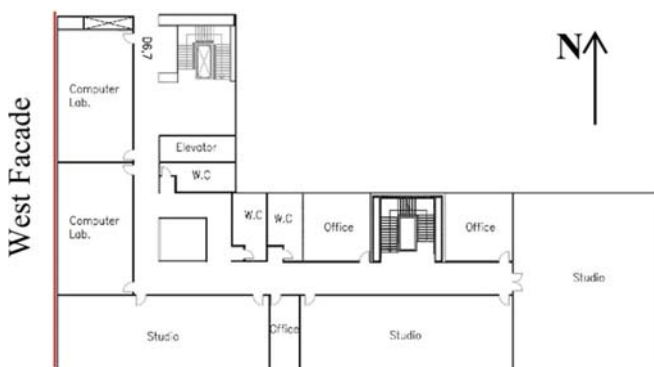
Typical Floor Plan of the Architectural Department of the D-Building
